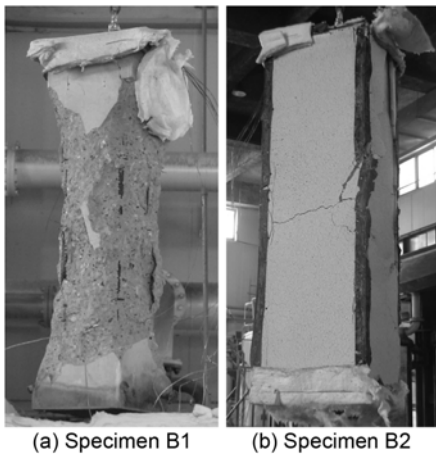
Fire test results on (a) spalled specimen B1 and (b) protected specimen B2
